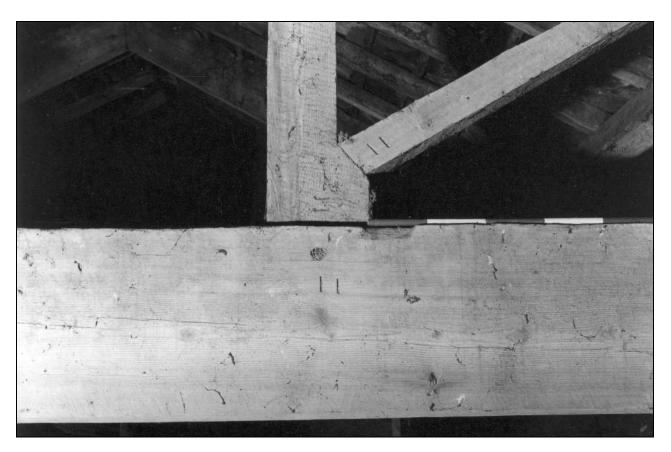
Detail of truss (type 2), with carpenter's marks "II", over milking parlour, from the south (film 2, frame 1)
